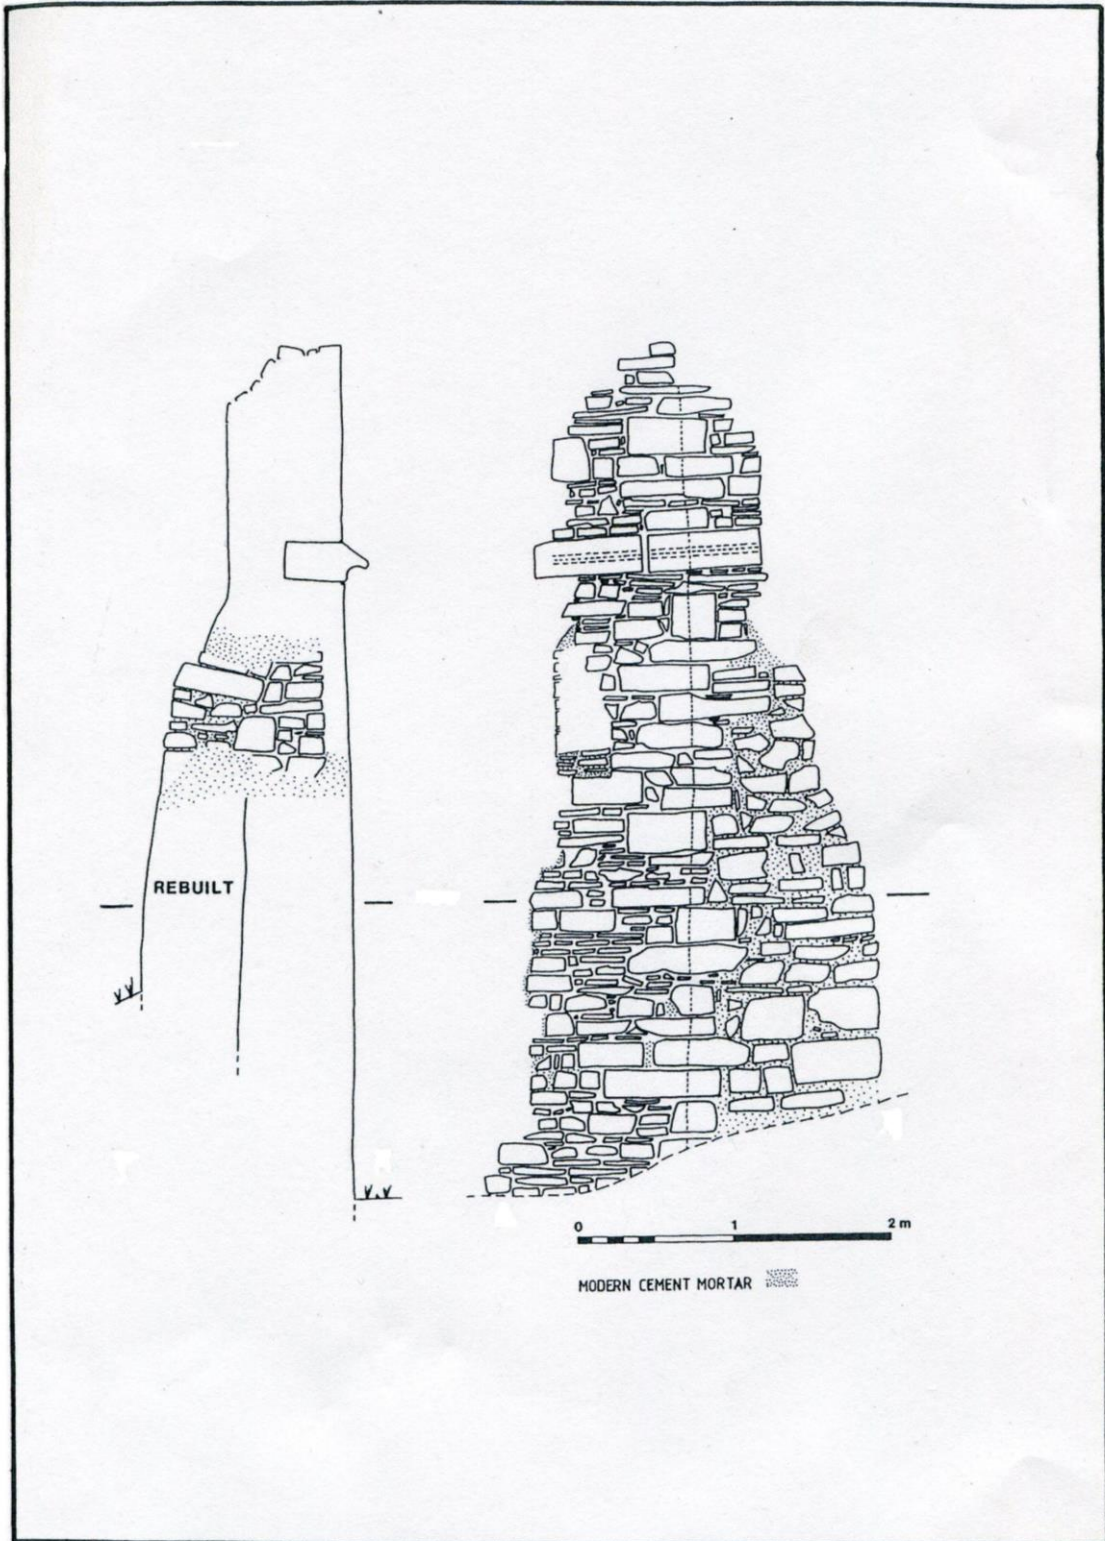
Drawing of the south facing elevation of the gate house tower, showing the previous south facing profile (after Thomas D).
